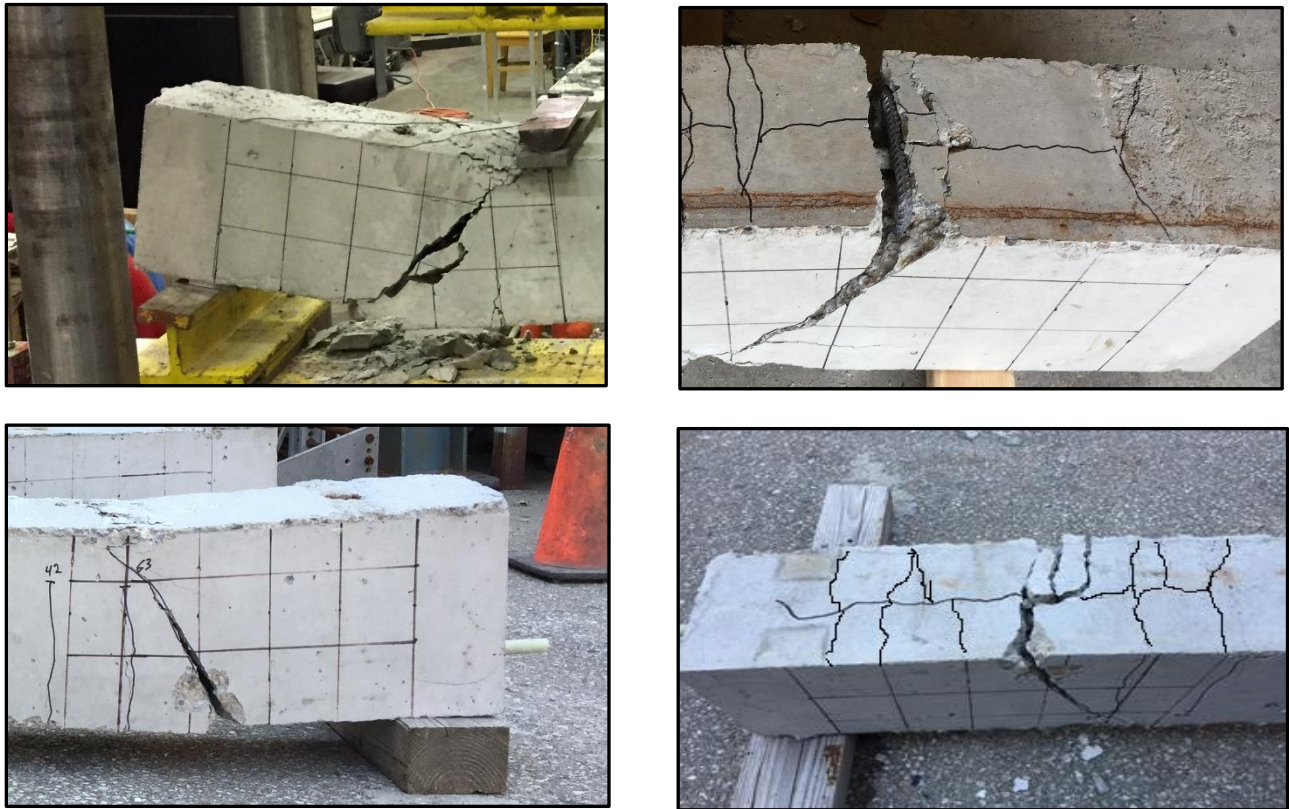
Bond failure for beams reinforced with non-prestressed sand coated GFRP bar
